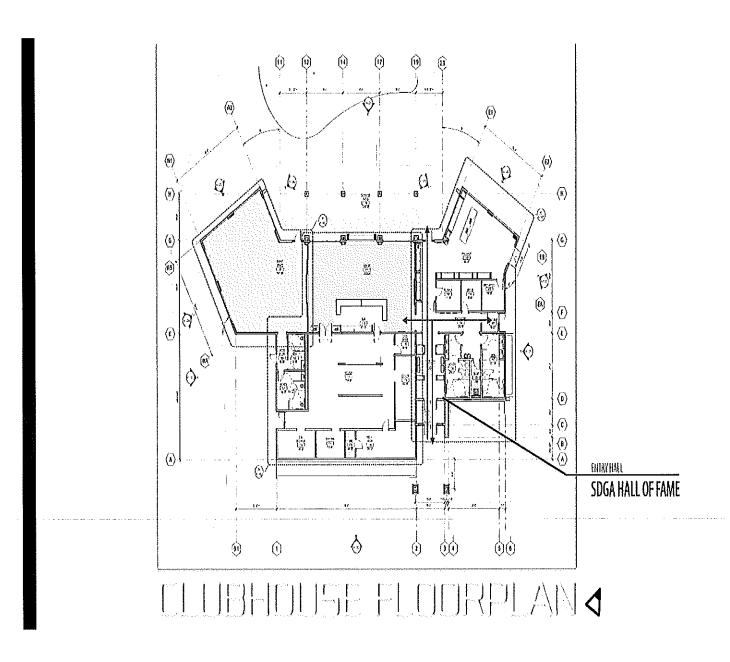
Exhibit B – SDGA Golf Hall of Fame – Indoor Space Plans
